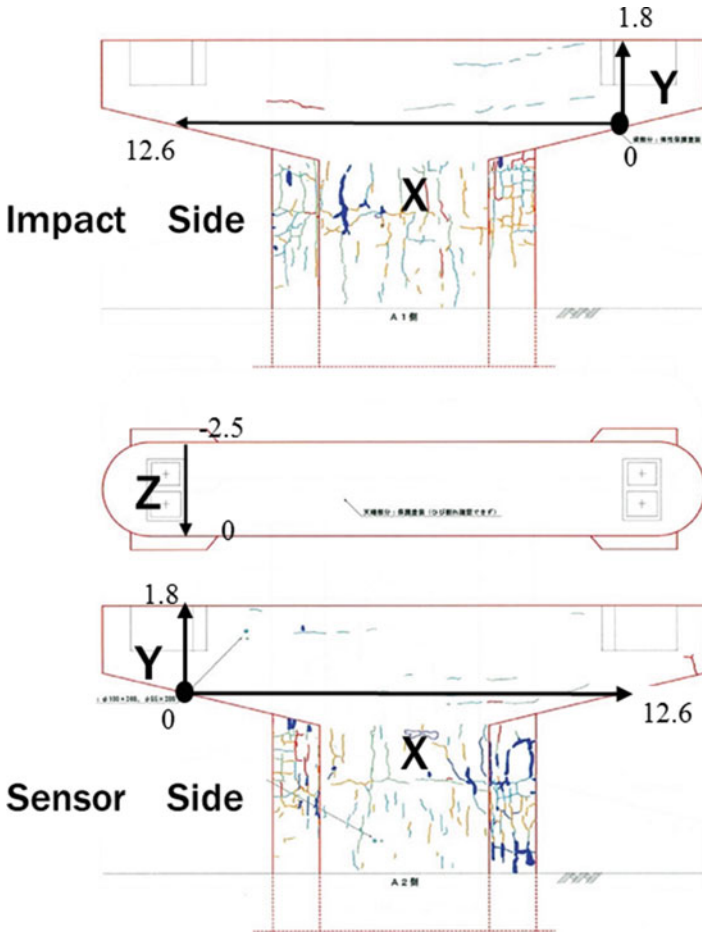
Surface damage of P3 and coordinate of bridge pier
